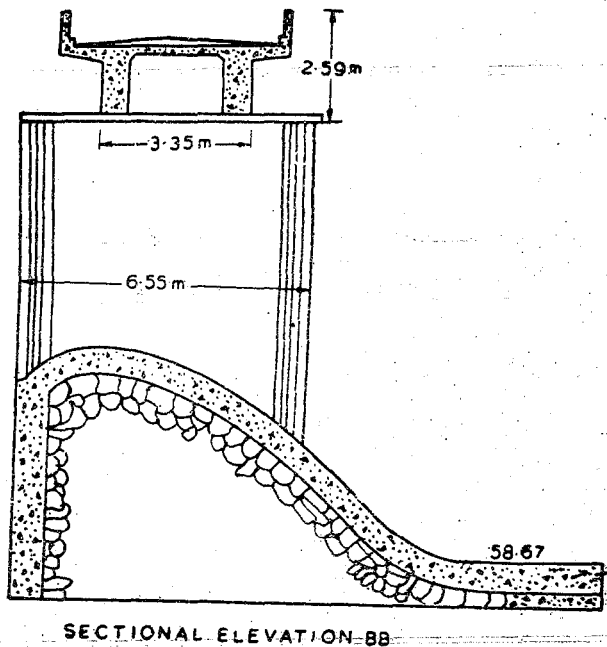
(a) Sectional elevation of Ottakkal weir.
